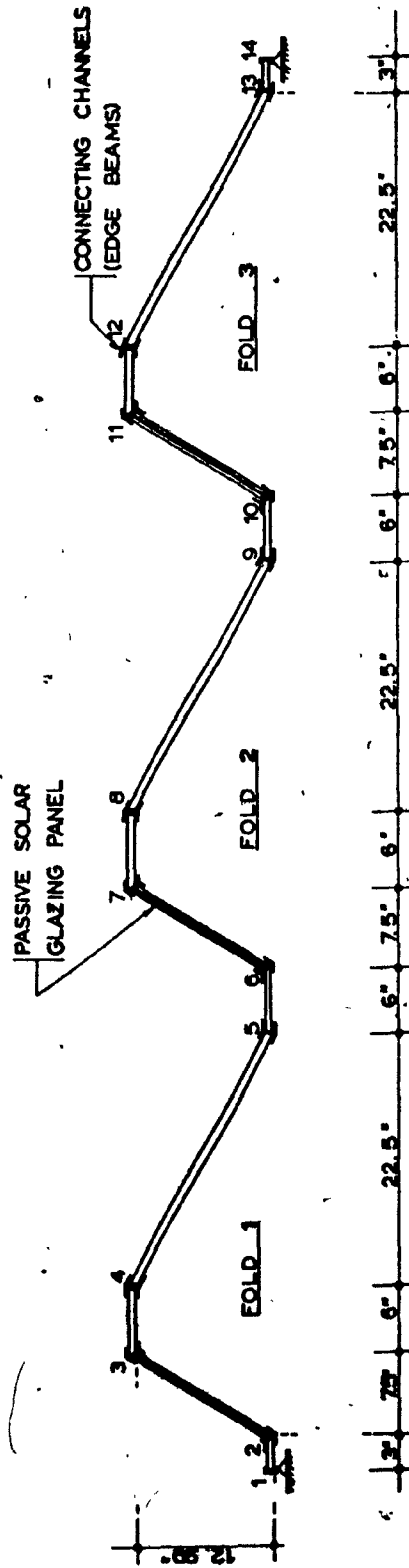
CROSS SECTION OF THE ANALYTICAL ROOF MODEL
